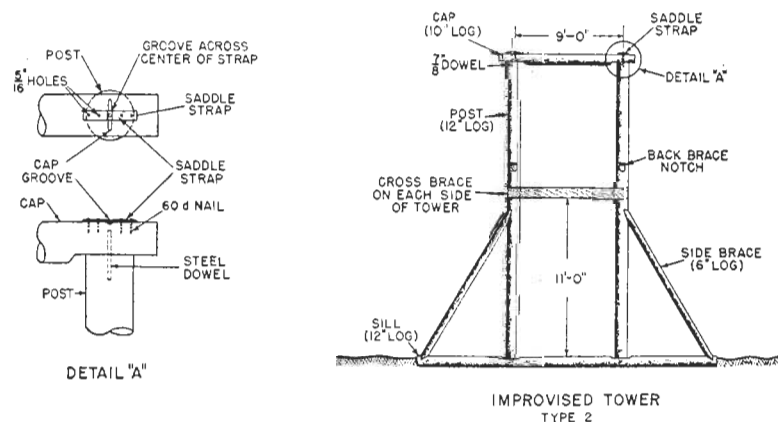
Improvised tower type-2 for suspension foot-bridge. Used on long spans when dimension lumber is hard to obtain.
